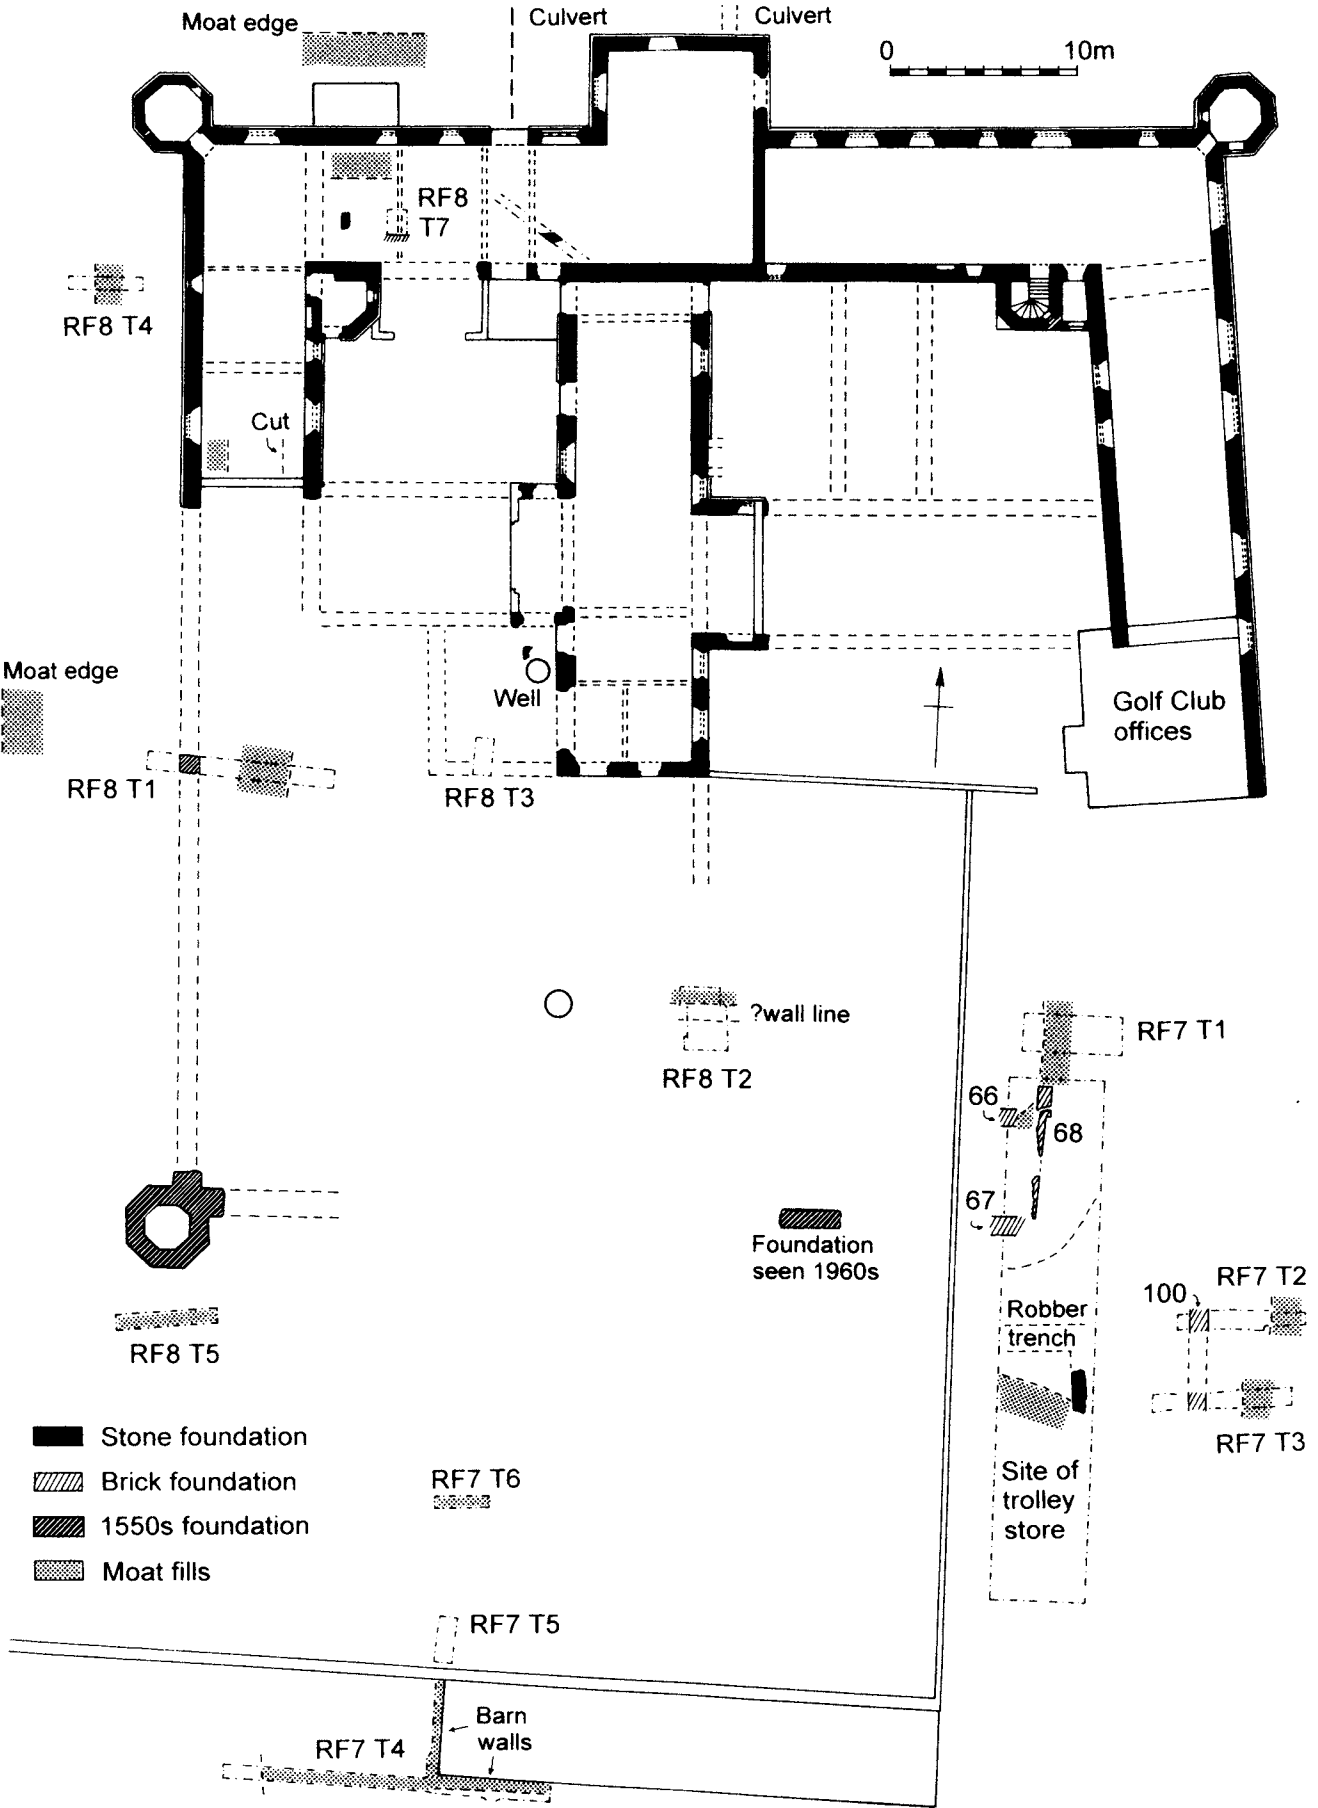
Rochford Hall, site plan showing the excavations and watching briefs.
